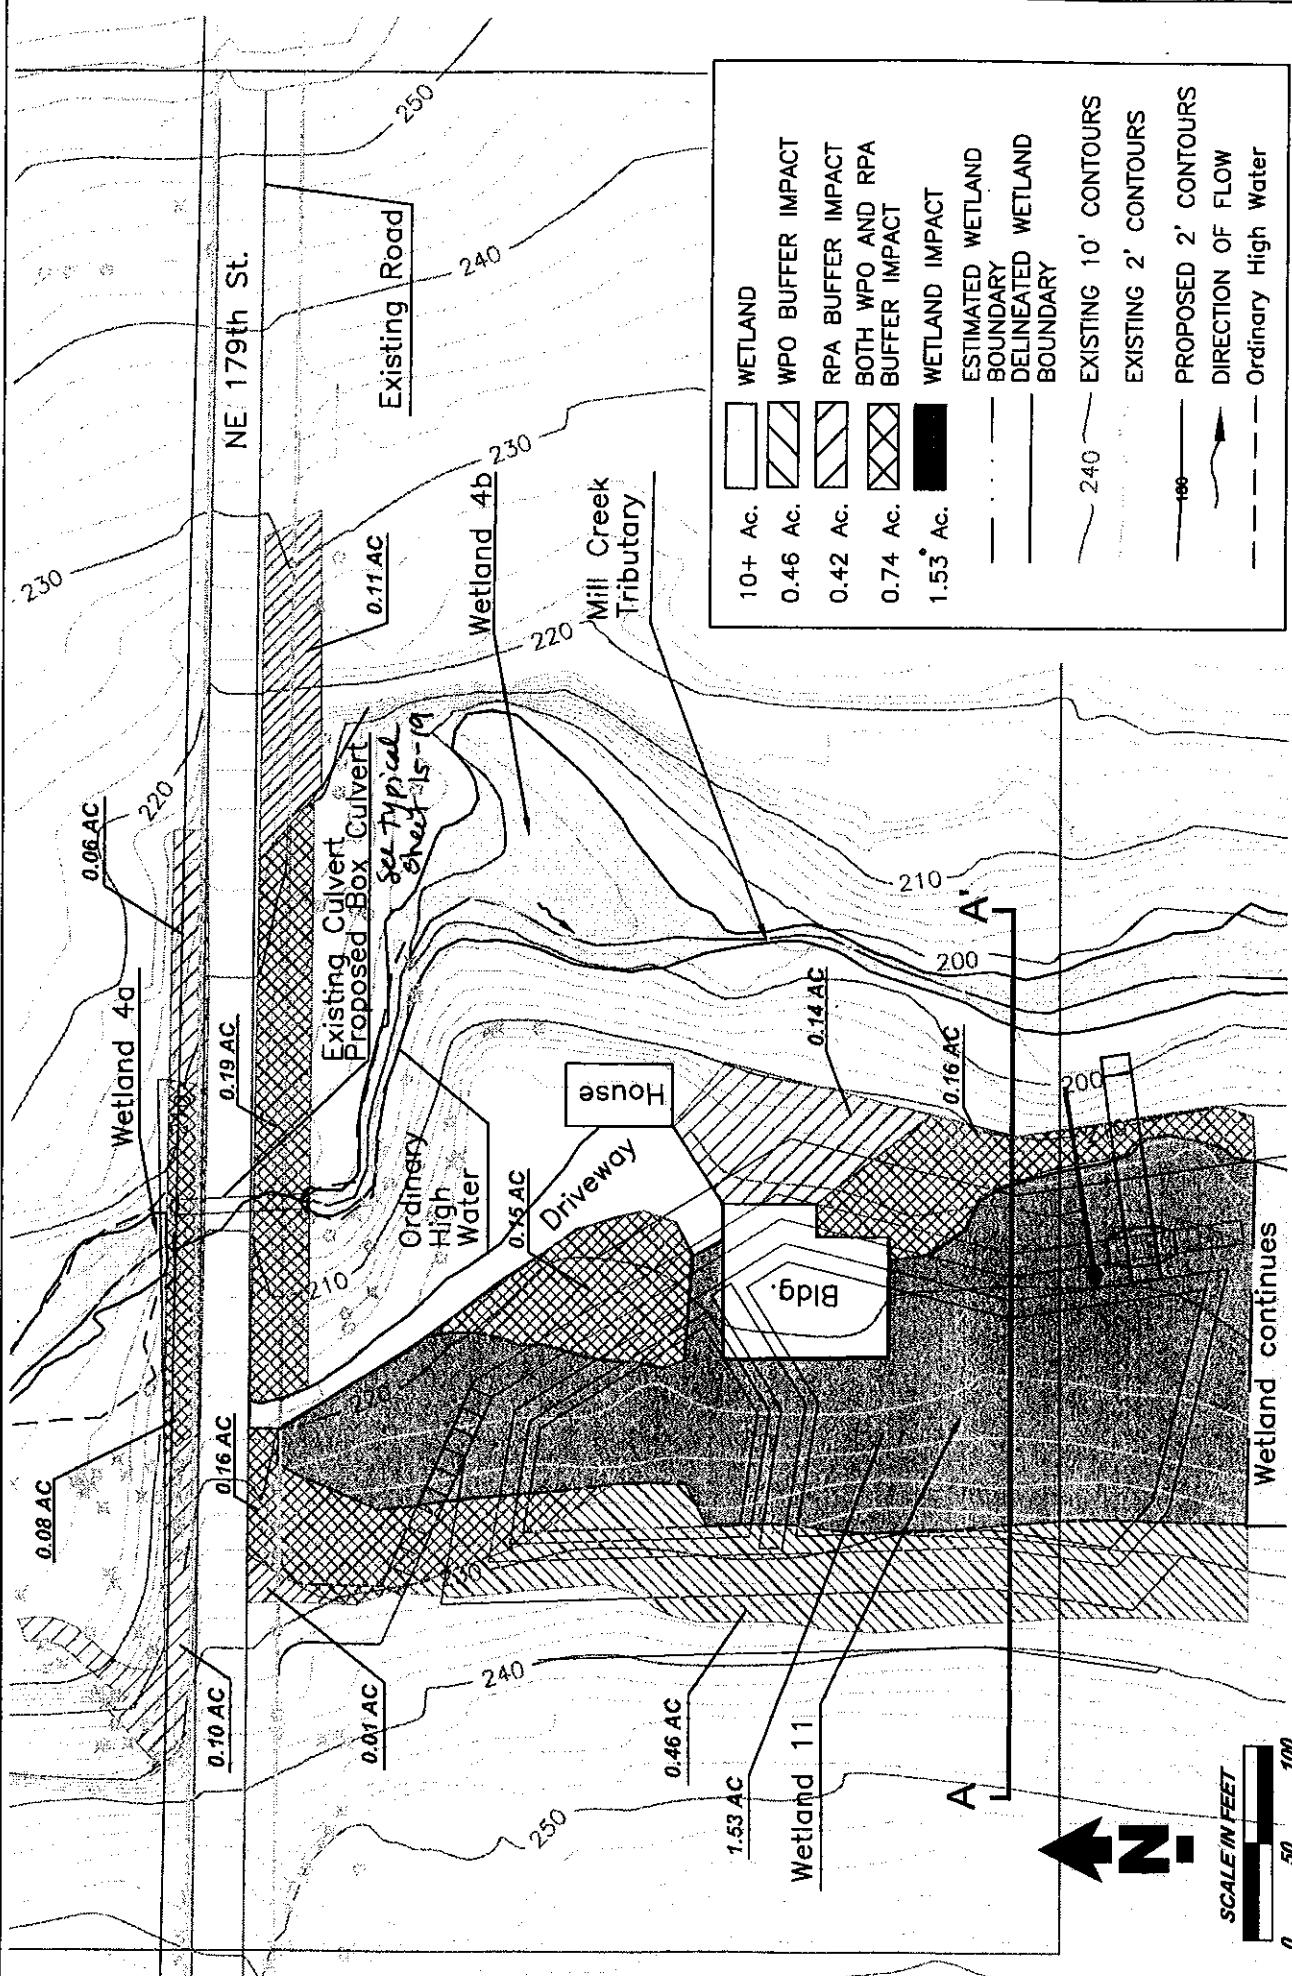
NE 179th St. Wetlands 4& 11, Stormwater Facility 3
